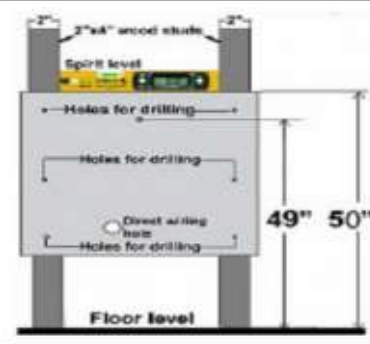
Mark and drill 6 mounting holes using 4mm or 5/32" wood drill bit.
